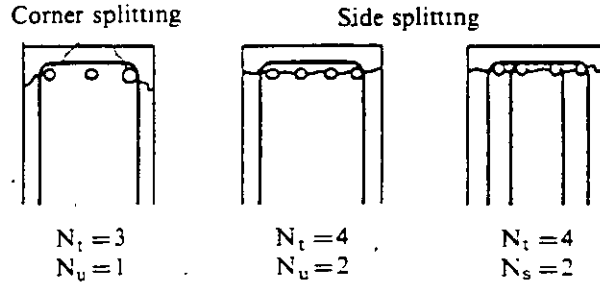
Corner splitting and side splitting modes including the face-side splitting.
